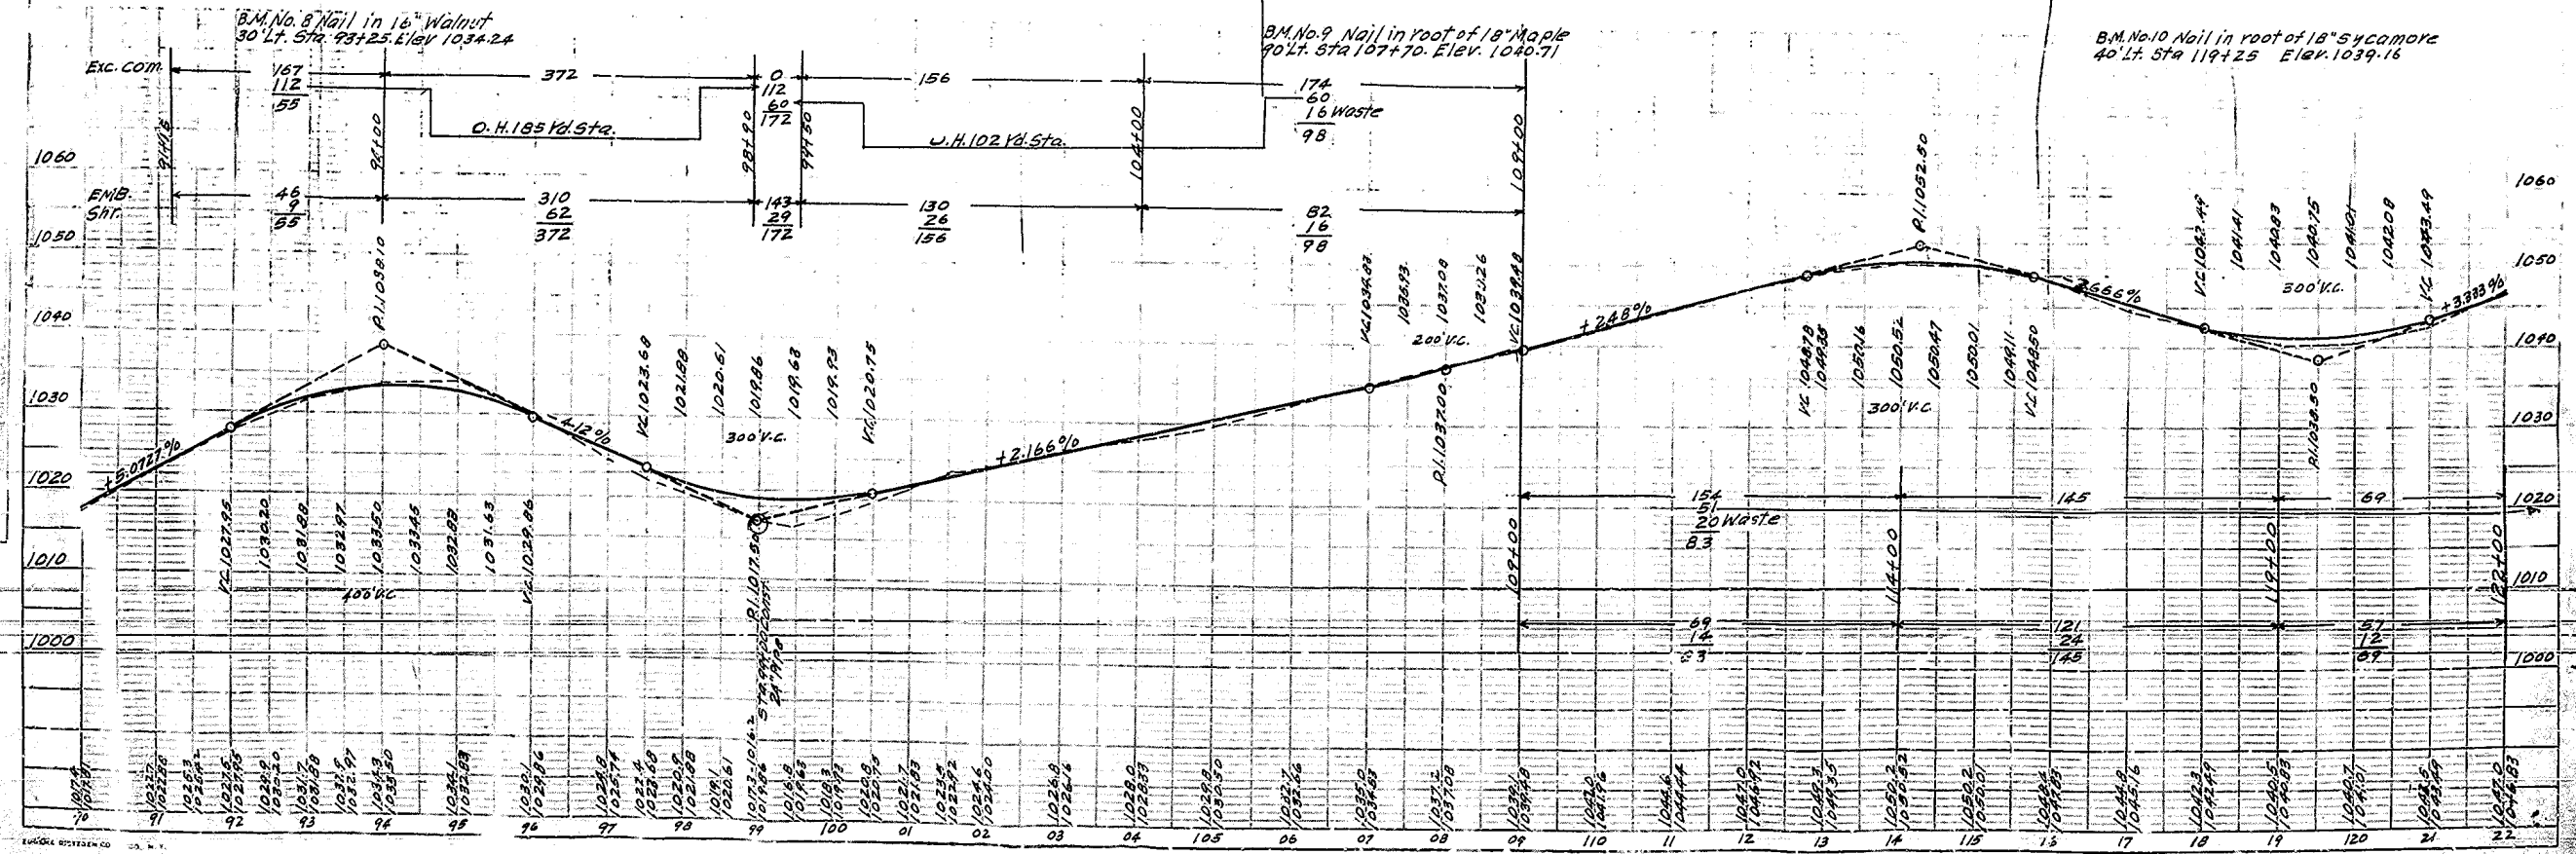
PLAN-PROFILE & P. STAKE-OUT
